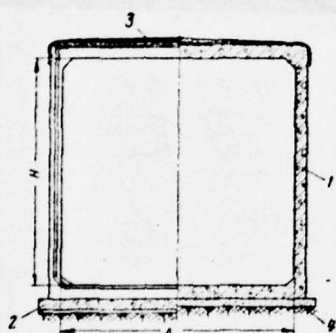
Collector/receptacle from closed blocks on project of Mosinzhproyekt. 1 - reinforced-concrete block; 2 - reinforced-concrete block/backing under joint; 3 - backing isolation/insulation of joint; 4 - sand training/preparation.
